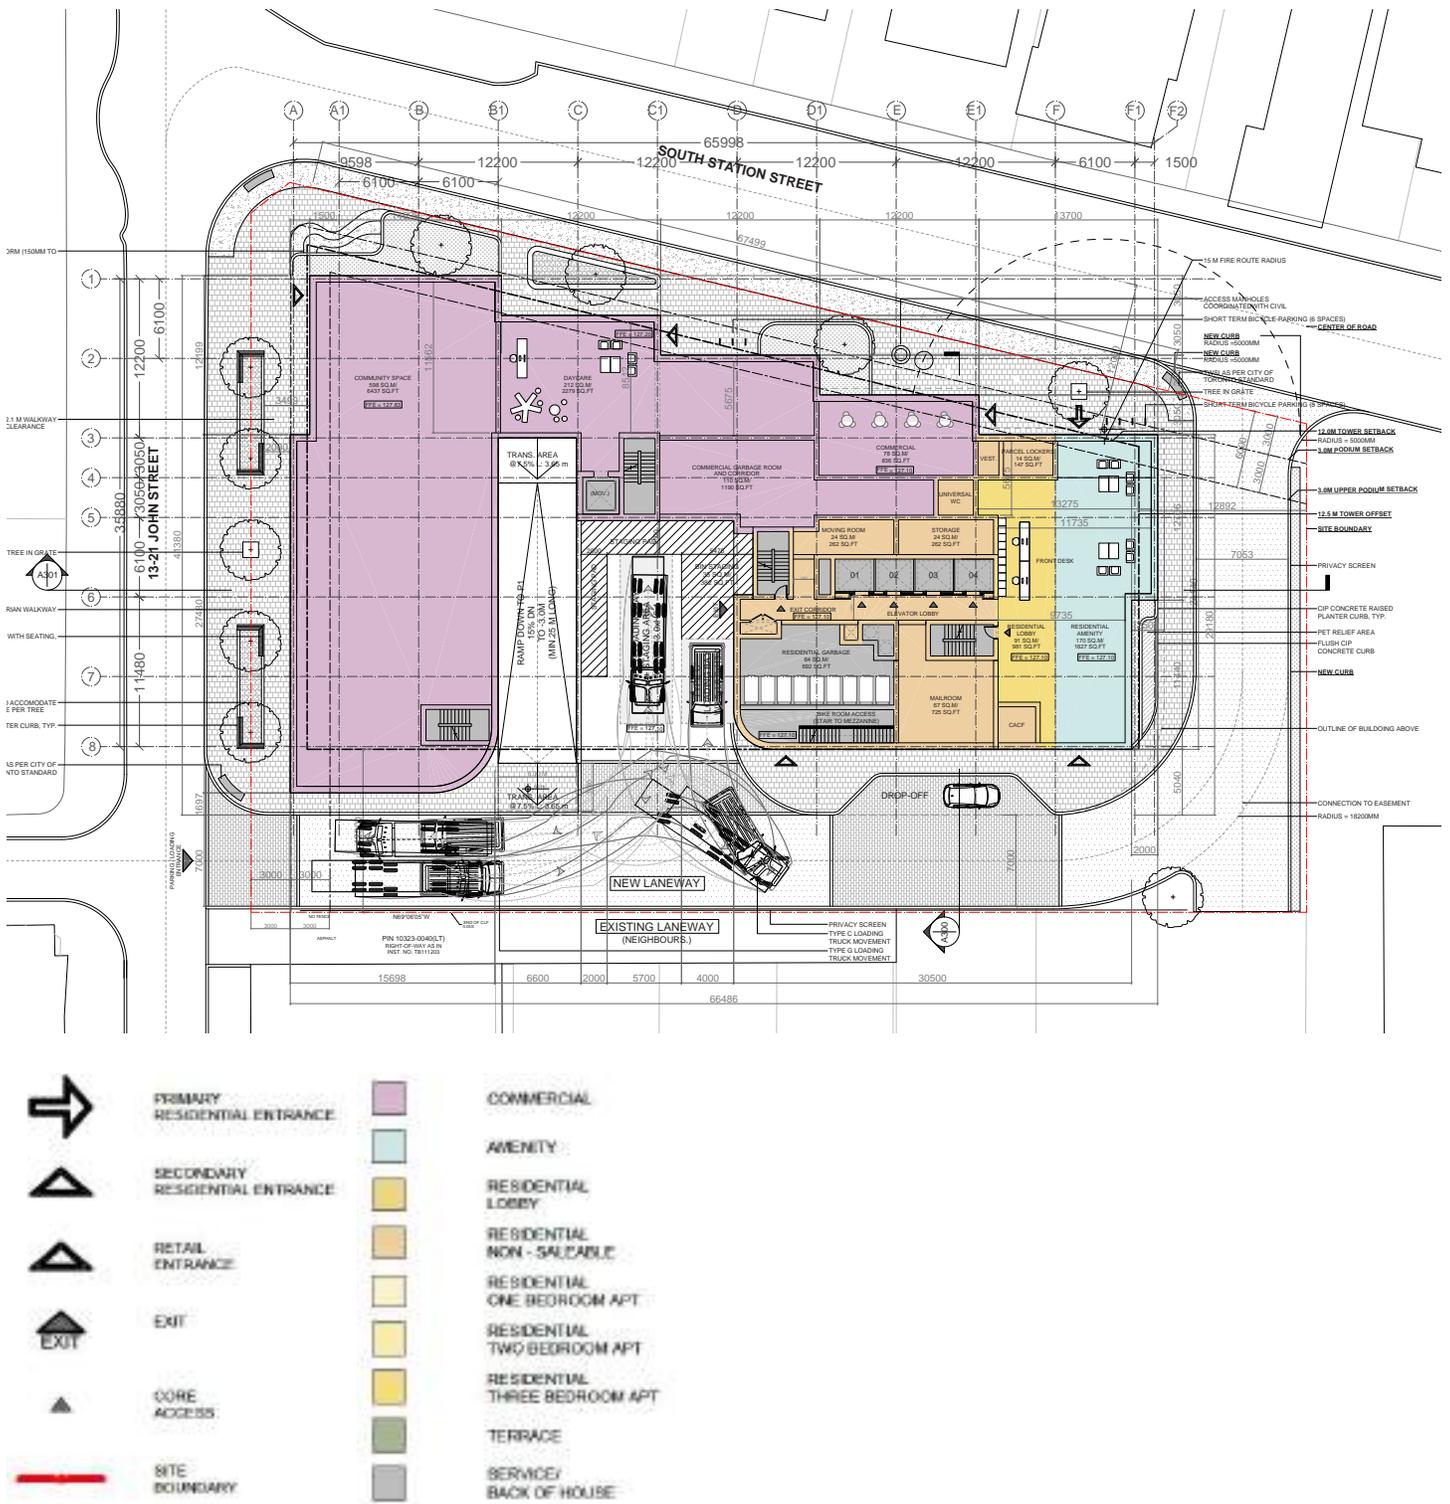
Ground Floor Plan (Prepared by 3XN USA LLC)
